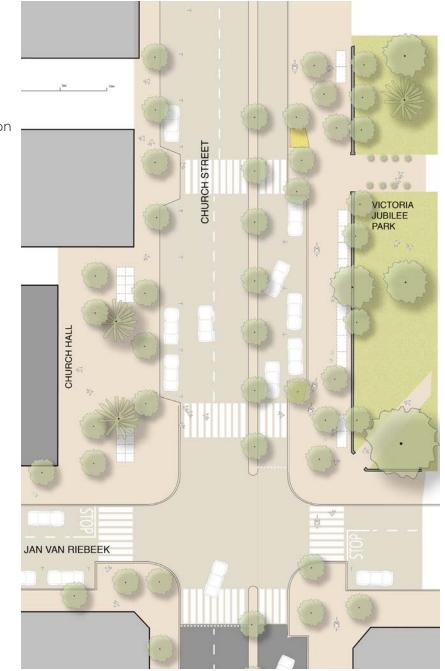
IPEDESTRIAN IMPROVEMENTS TO CHURCH STREET
